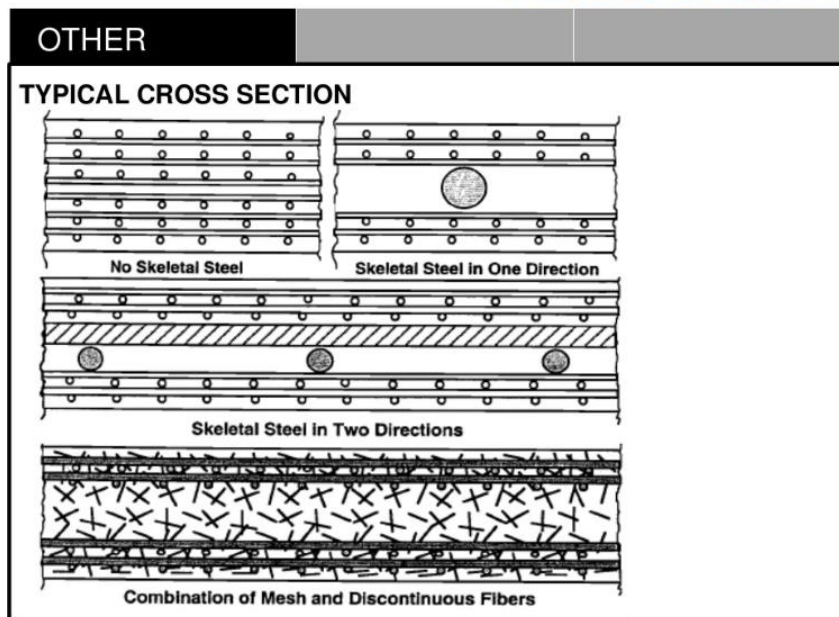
cross section of ferrocement with the wire mesh and the steel rebars [37]
